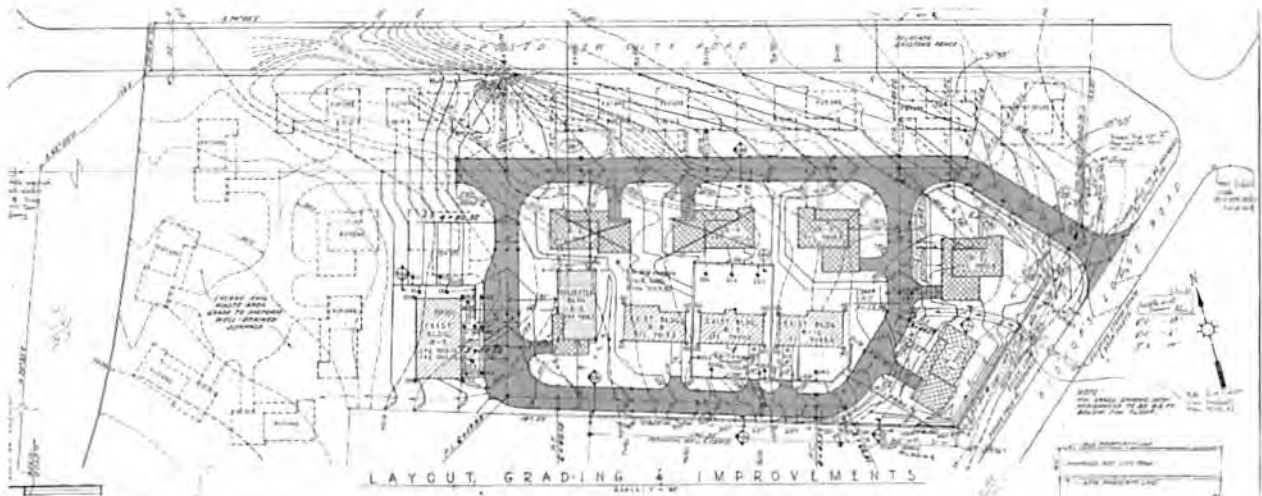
Portion of layout and grading plan showing cottages to be constructed, June 1960.
